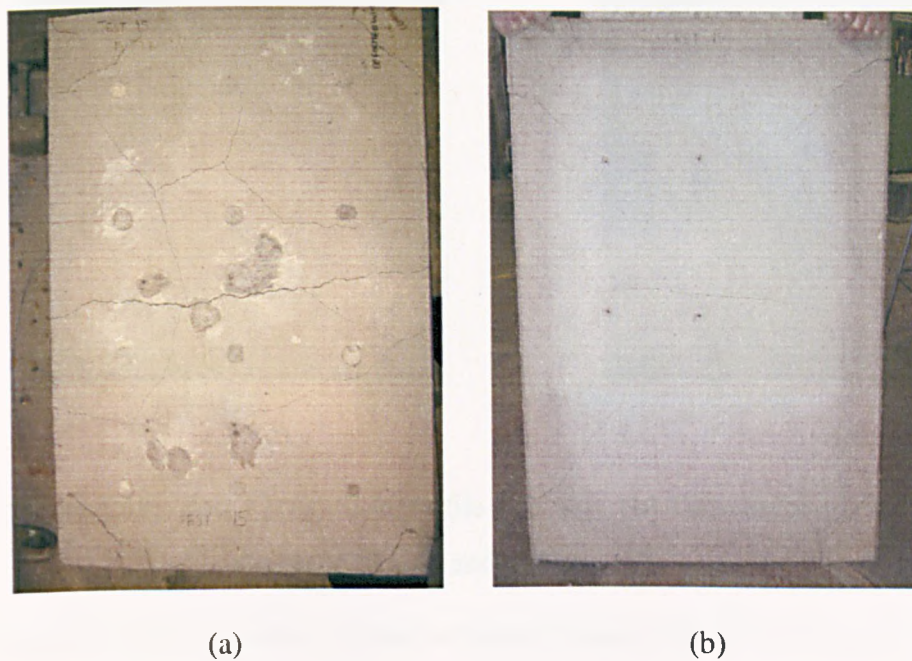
Test 15: (a) View of top surface of slab (b) View of bottom surface.
